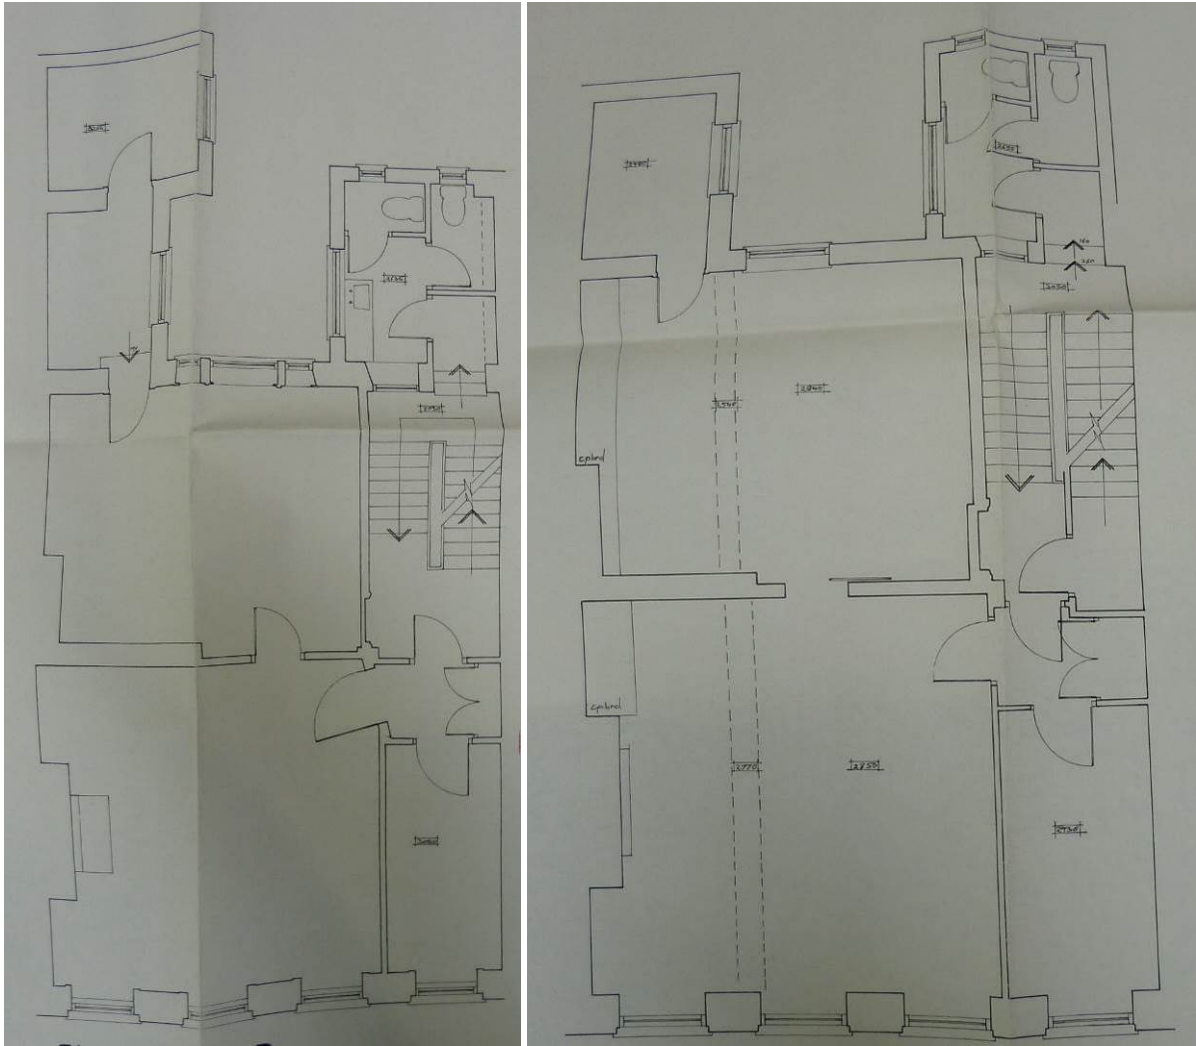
First (left) and second floor plans as existing in 1990, Gerald Steer (LB Camden, planning file)
